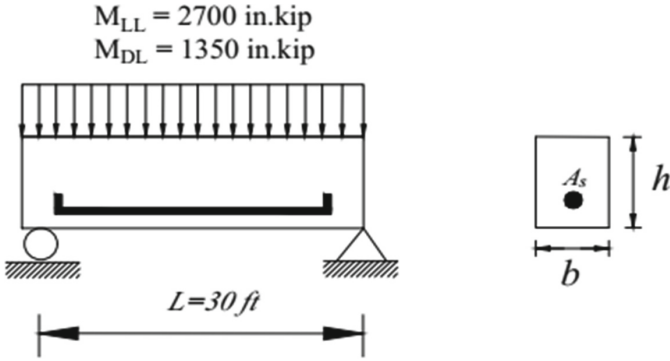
Structural model and details for simply-supported RC beam design [19]
